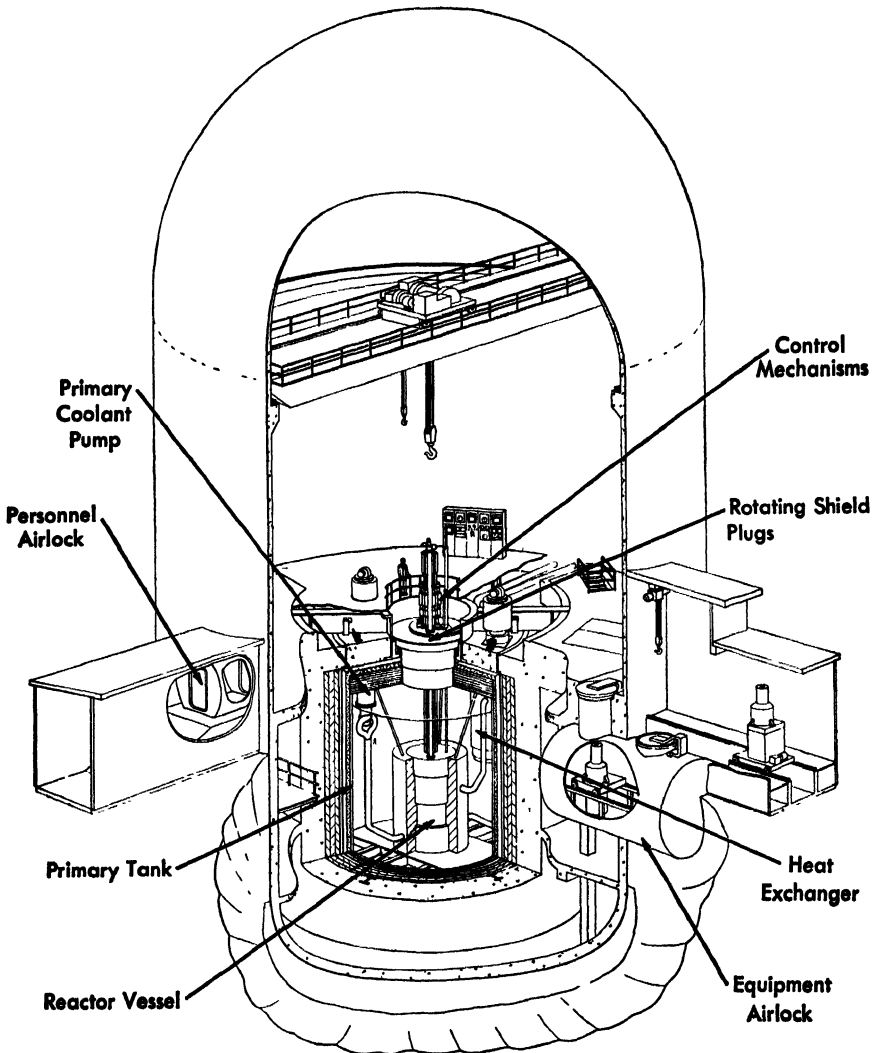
Cutaway drawing of the EBR-II plant, showing the arrangement of major heat-transfer and service equipment.
